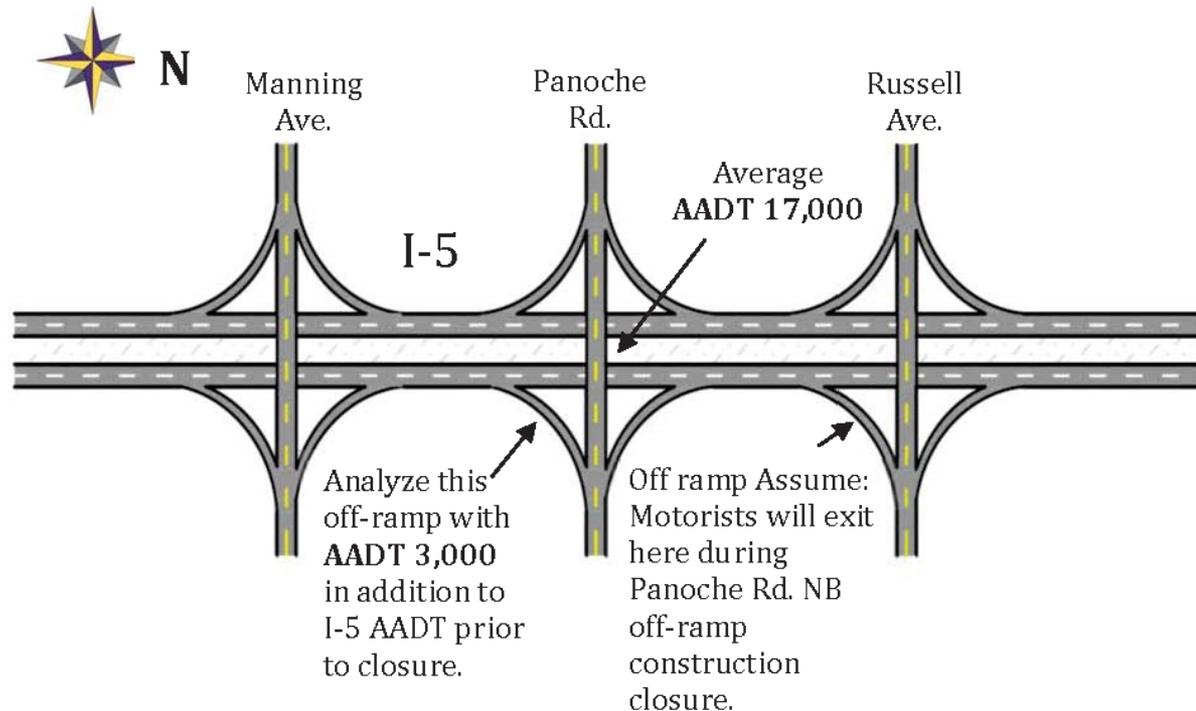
Layout showing AADT for I-5 and for off-ramp (pre-construction)
